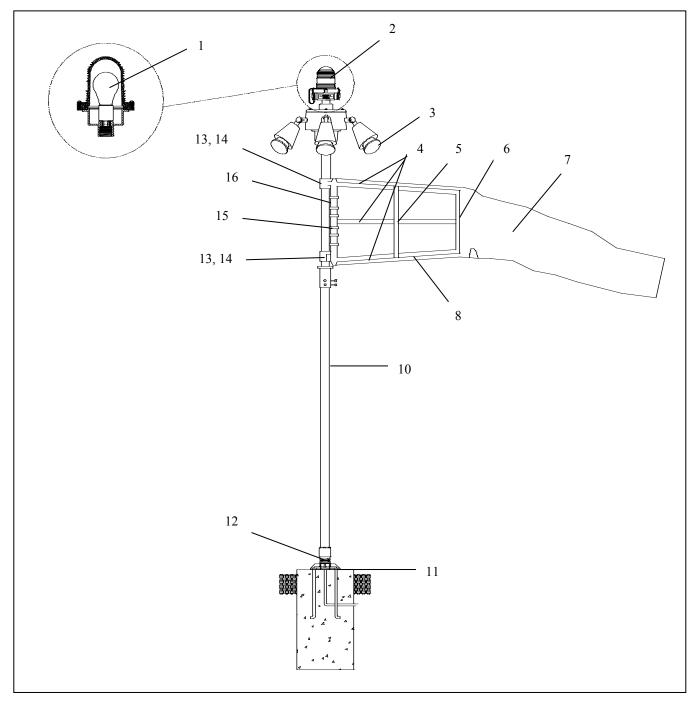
L-806 Wind Cone (With External Lighting Assembly)
